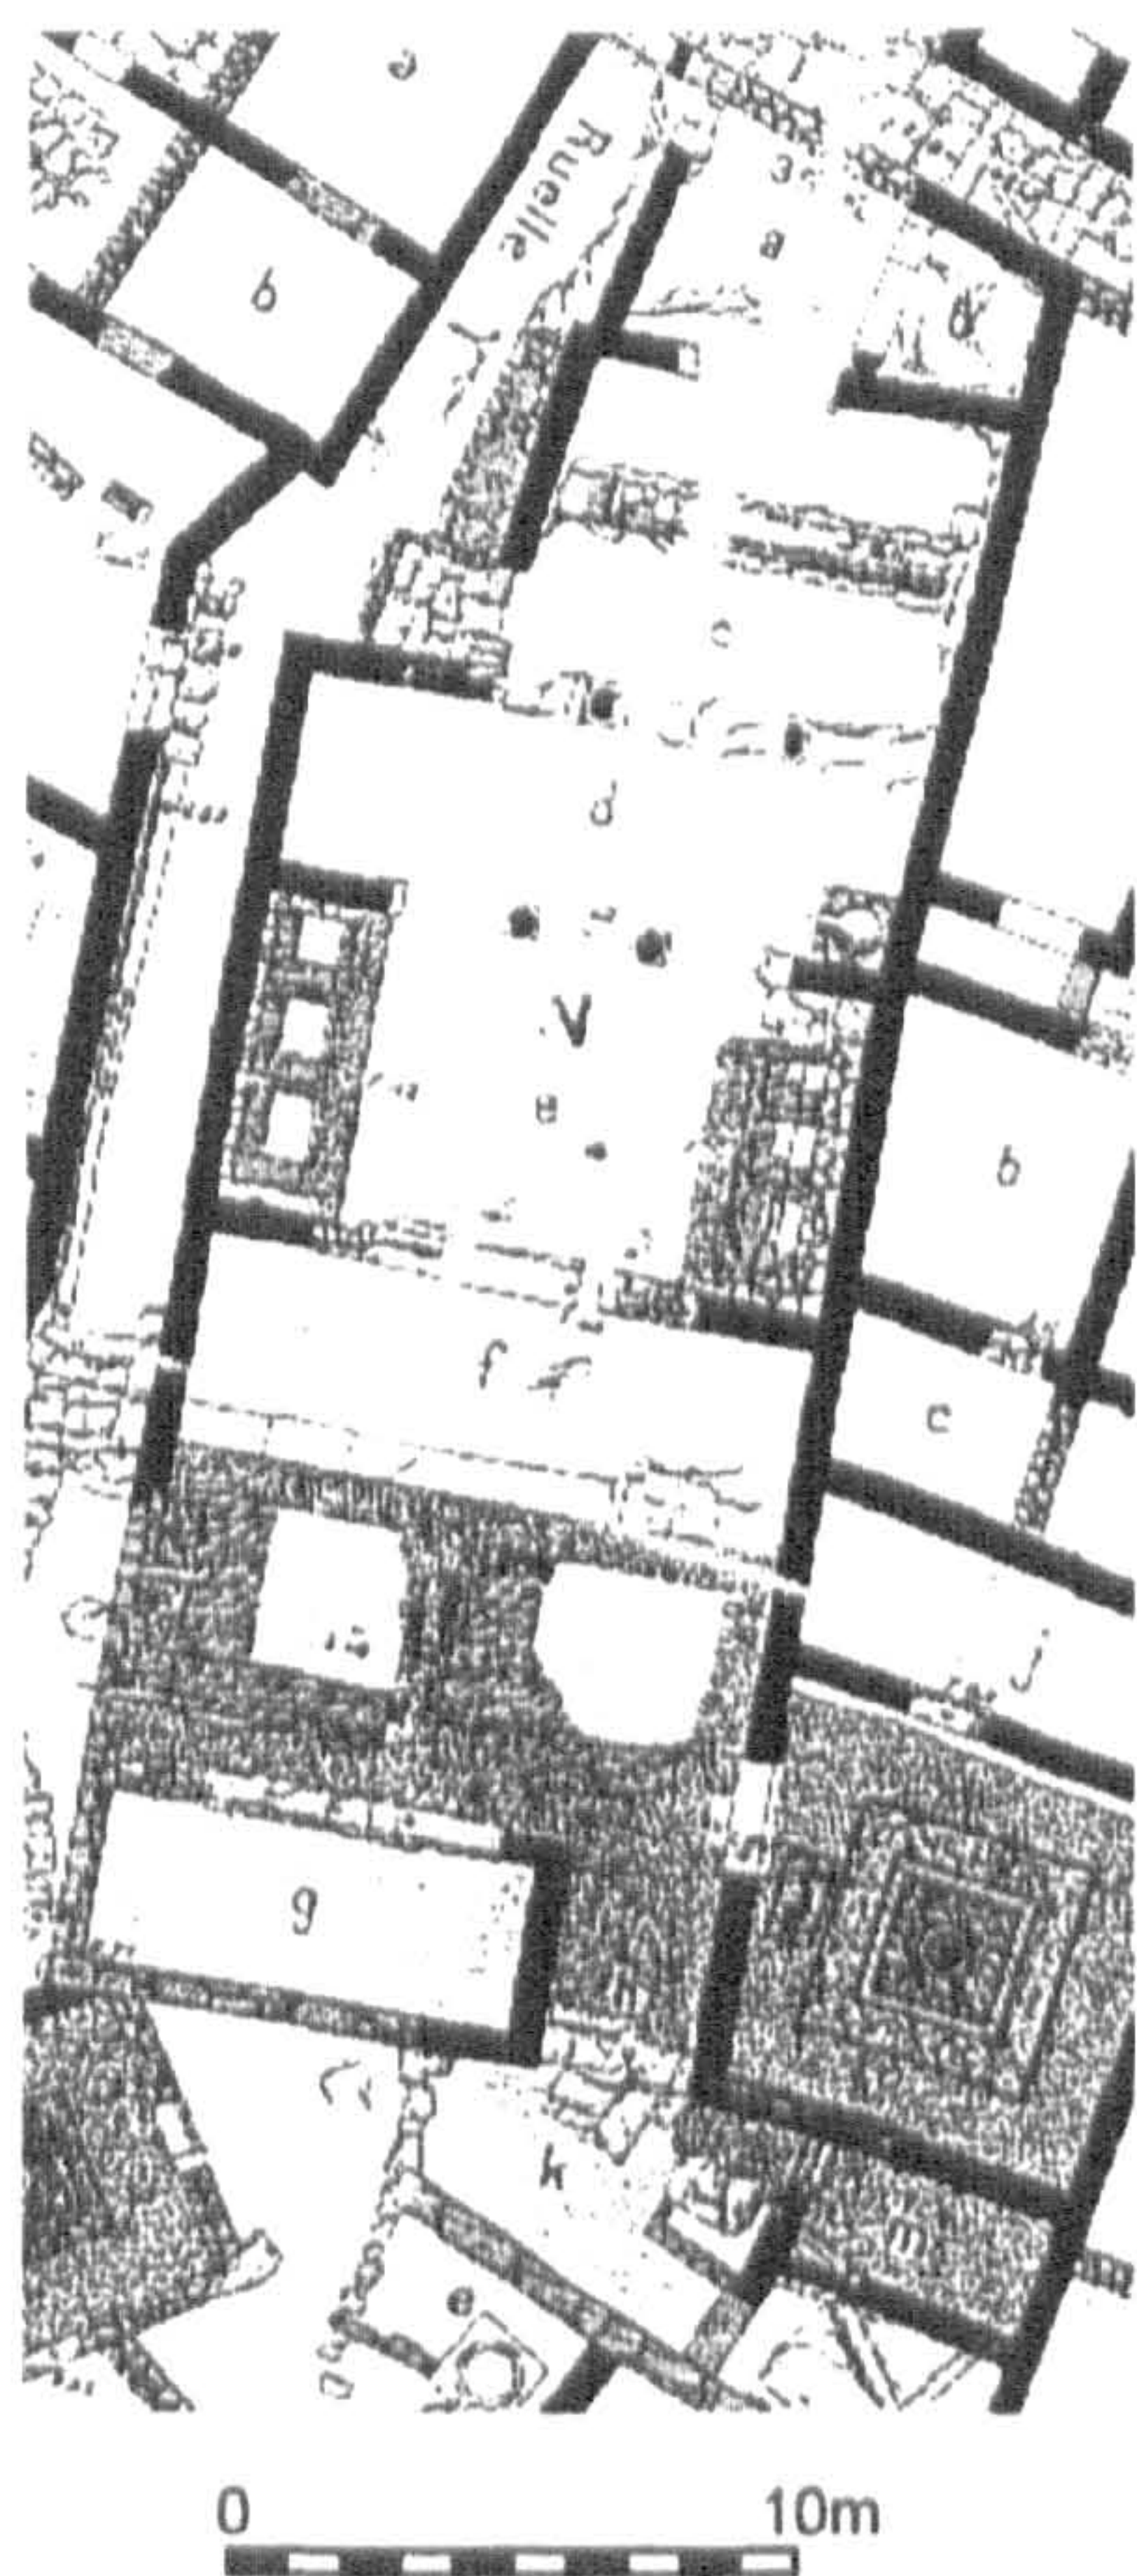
Plan of STR 7 showing circular arrangement of flagstones (Chamonard 1922 Plates III-IV)
